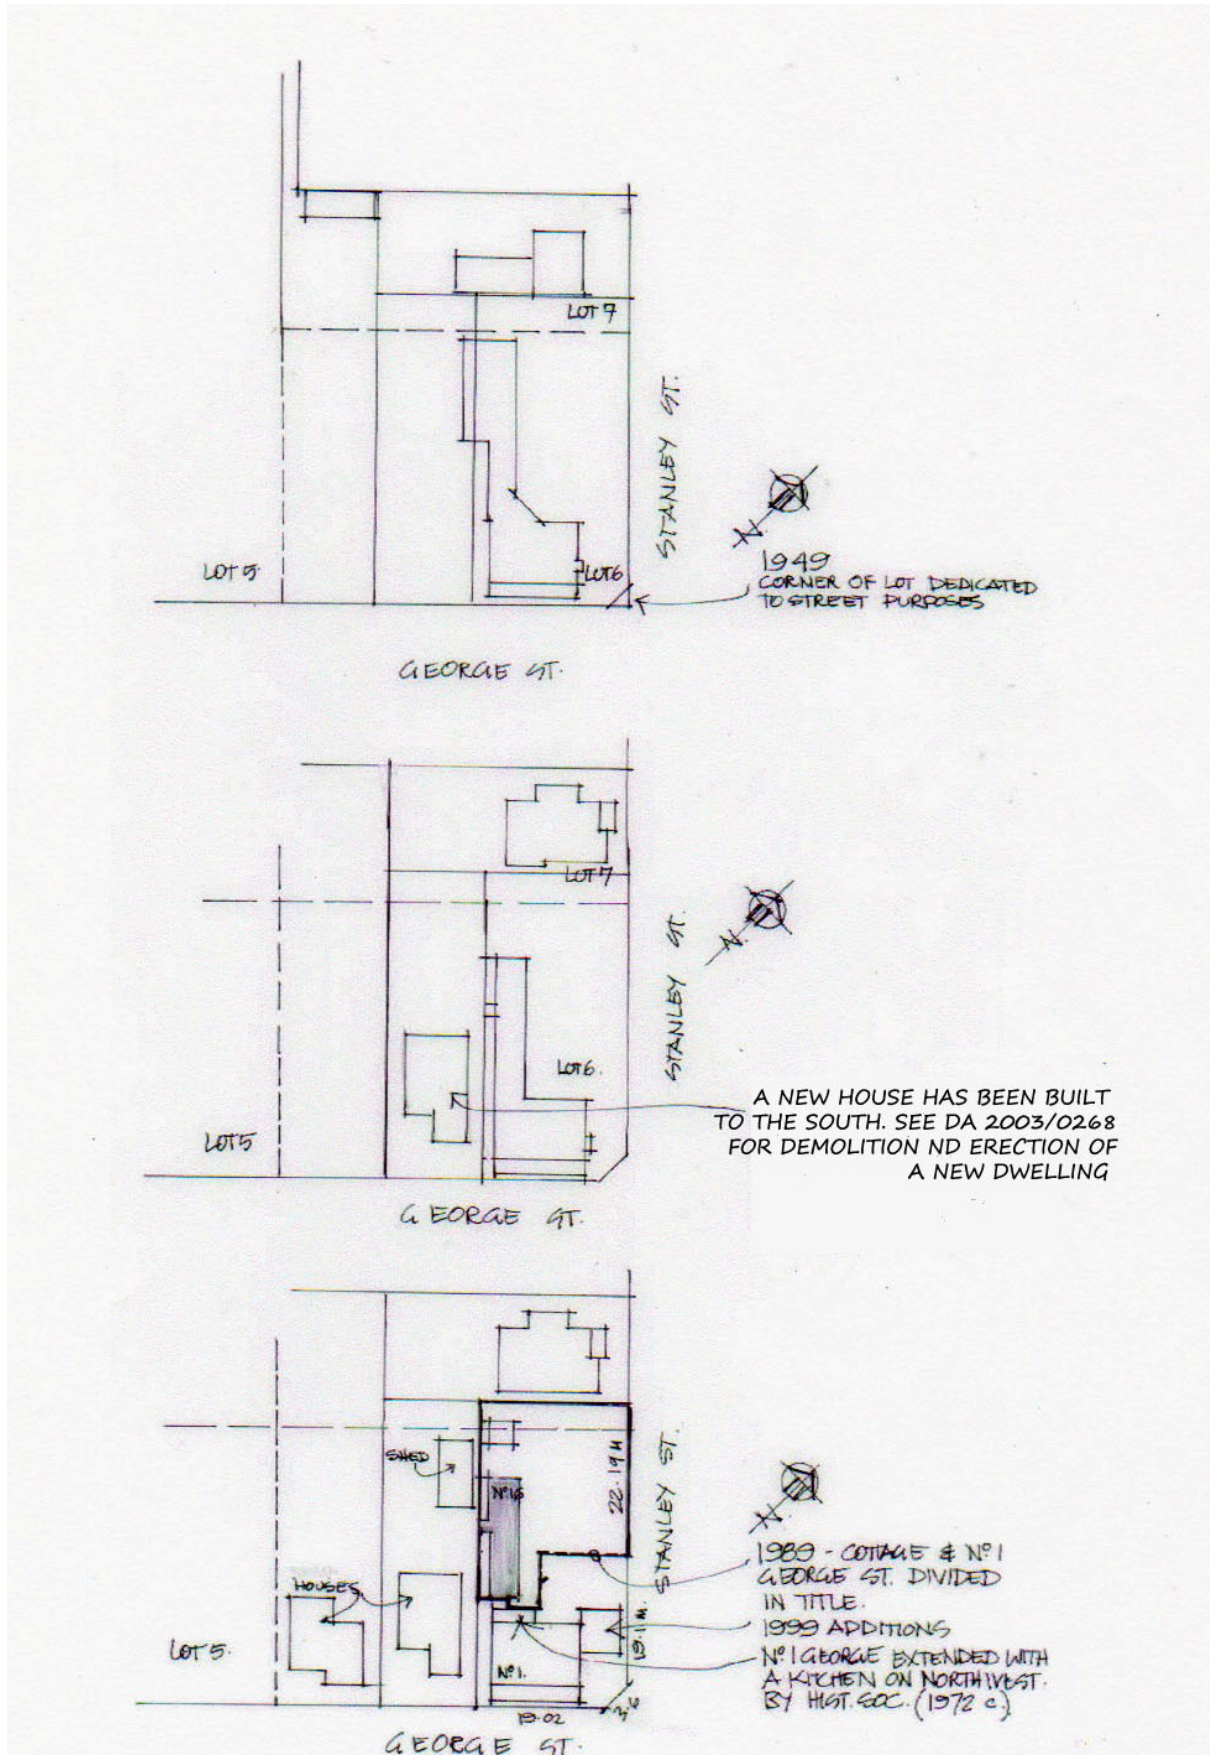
Progressive Site Plan. Drawn by BJ Hickson
